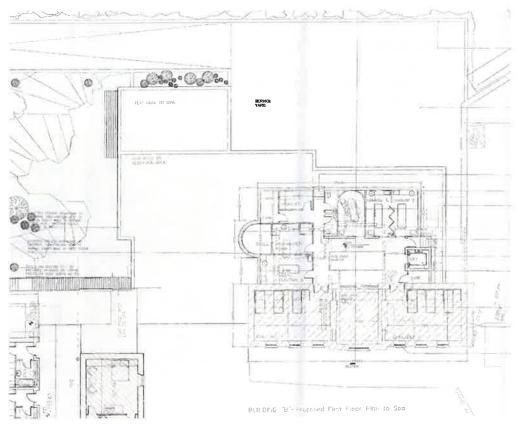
Proposed First Floor Plans lodged as part of the planning application
